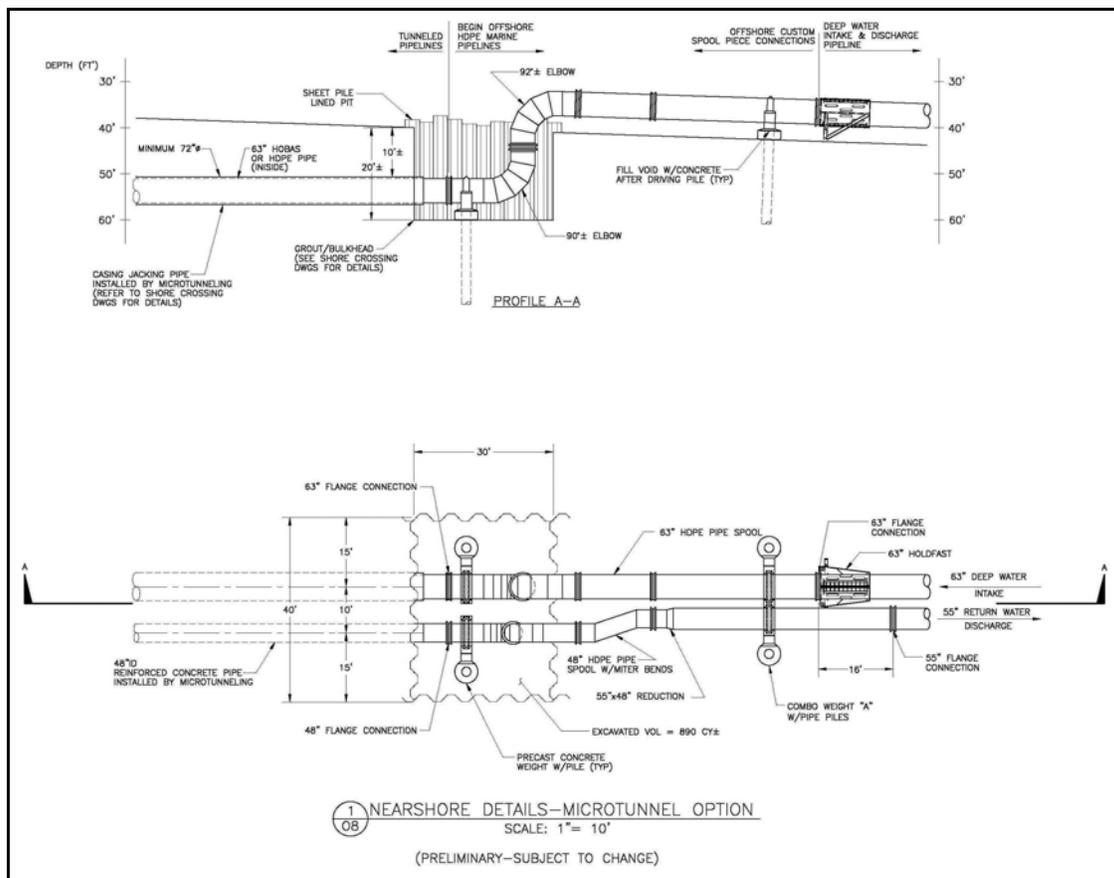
Details of Connection Between Microtunneled and Surface-mounted Segments of Seawater Pipes
